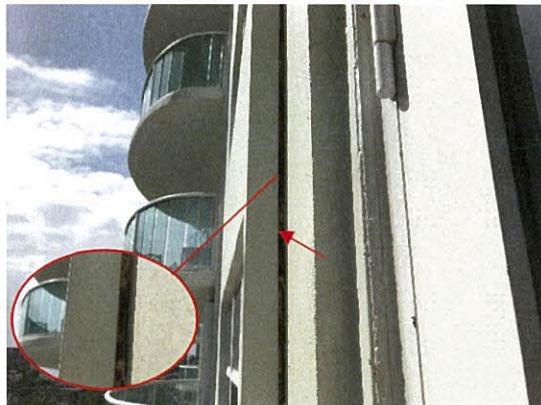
Cable cover detached from wall caused by the buffeting generated by Irma's wind pressures exerted on the building envelope. Water entered the unit interior through cable opening at wall (unit 406S).
